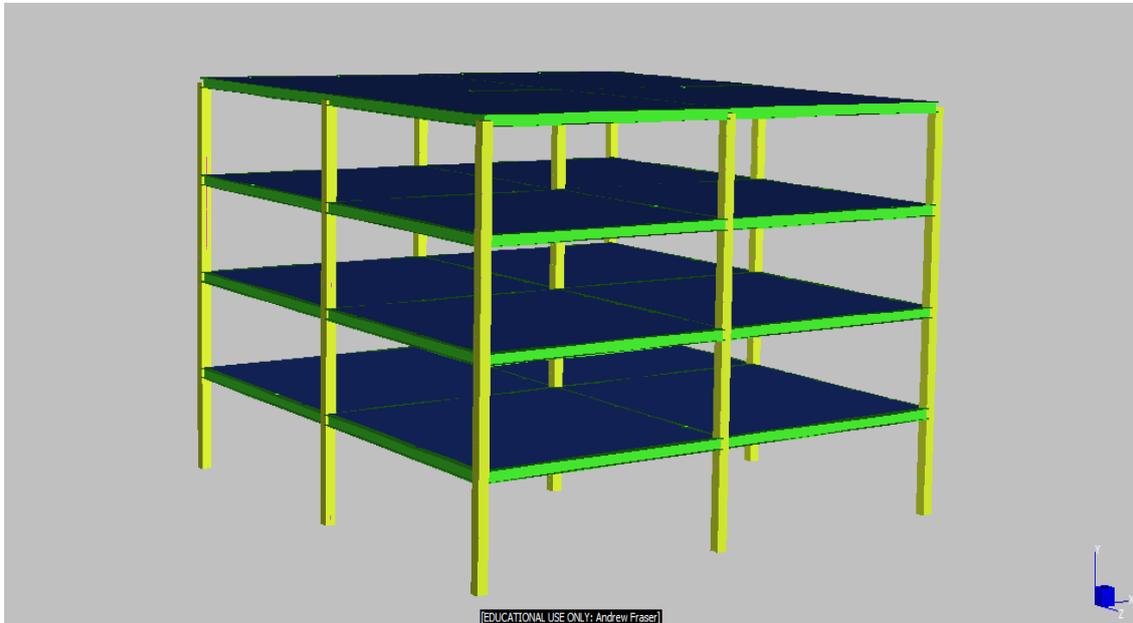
Reinforced Concrete Framed Building FE Structural Model
